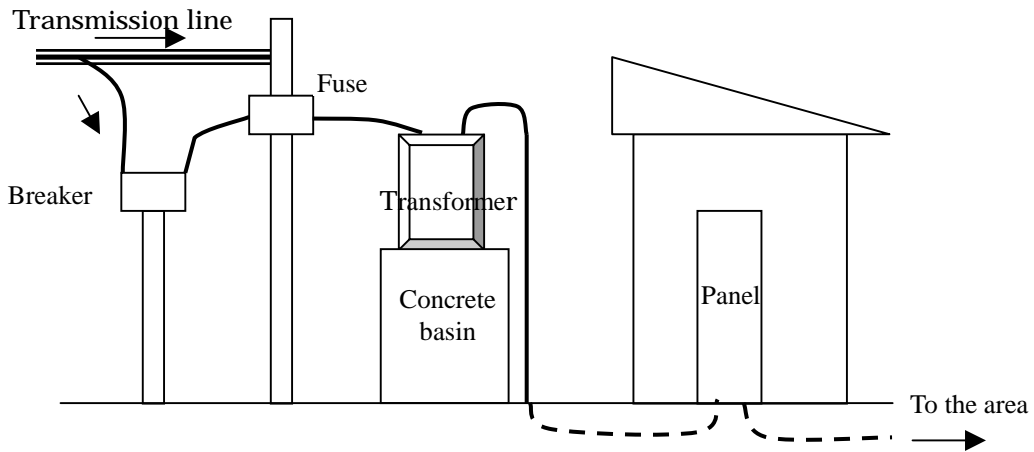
General Layout of Facilities in Substation
